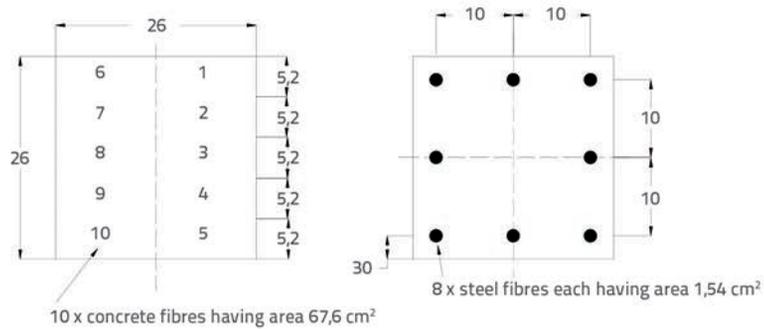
Column cross-section for first floor composed of 10 concrete fibres and 8 steel fibres (left) for concrete and (right) for steel
